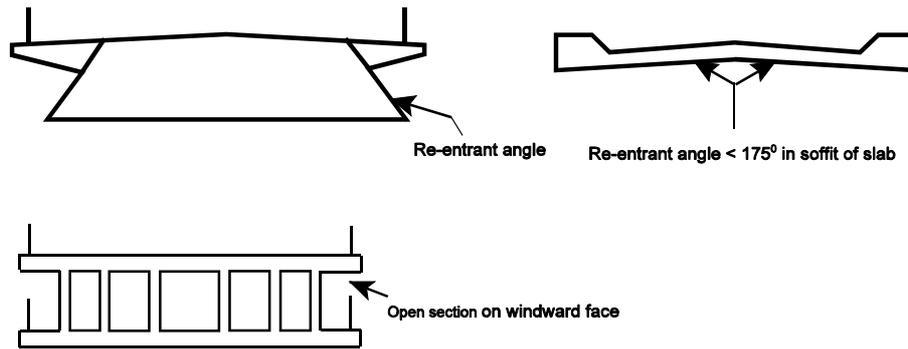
Typical bridge cross-sections that require wind tunnel tests
